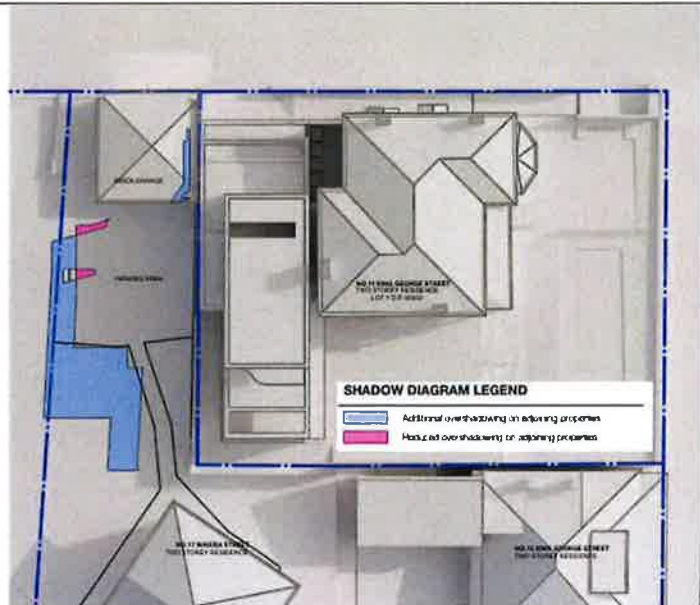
Proposed Shadow Diagram 21 June 12pm
